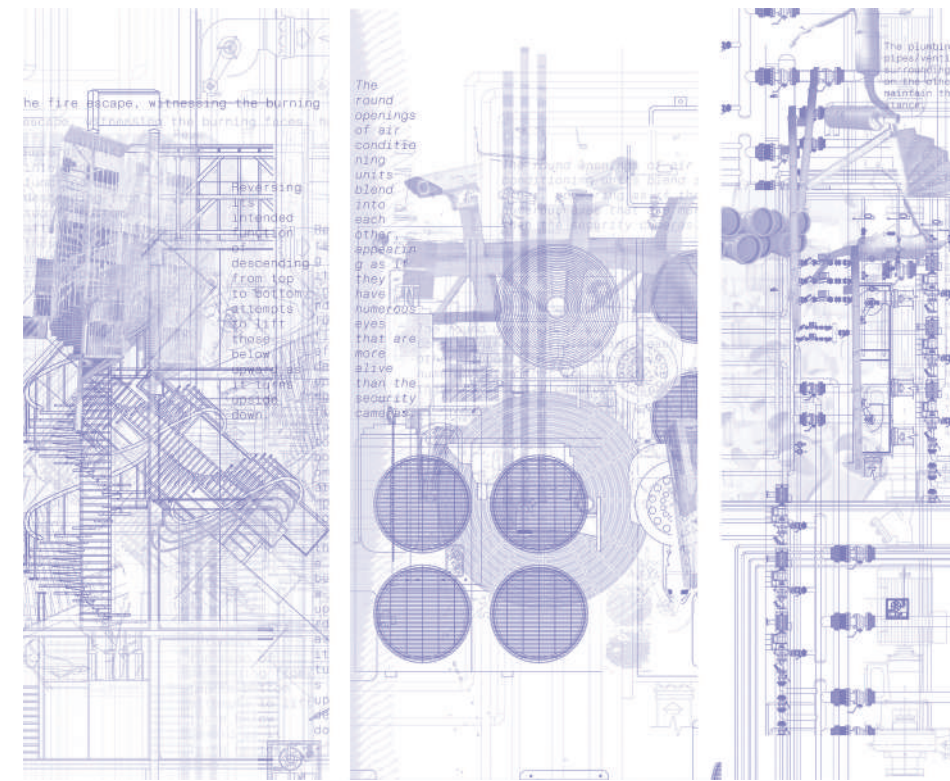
Zooming into the details: fire escape stairs, HVAC units and Security Cameras, Plumbing Pipes.
